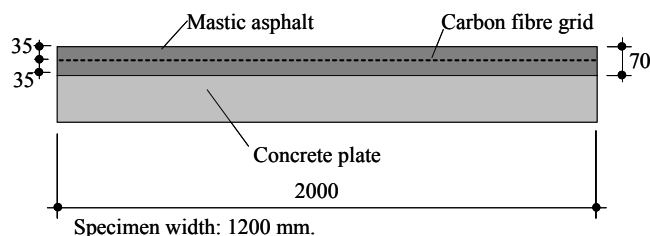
Longitudinal cross section of MA specimens for MMLS rut tests at 45 and 60°C (units in mm)
